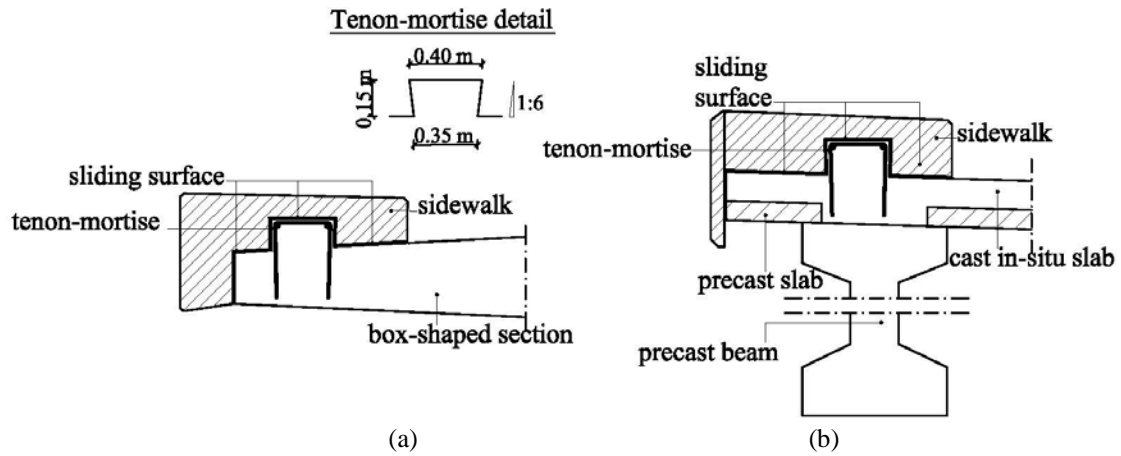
Structural configuration for the avoidance of the buckling (a) bridge with box-shaped deck's section and (b) precast I-beam bridge
